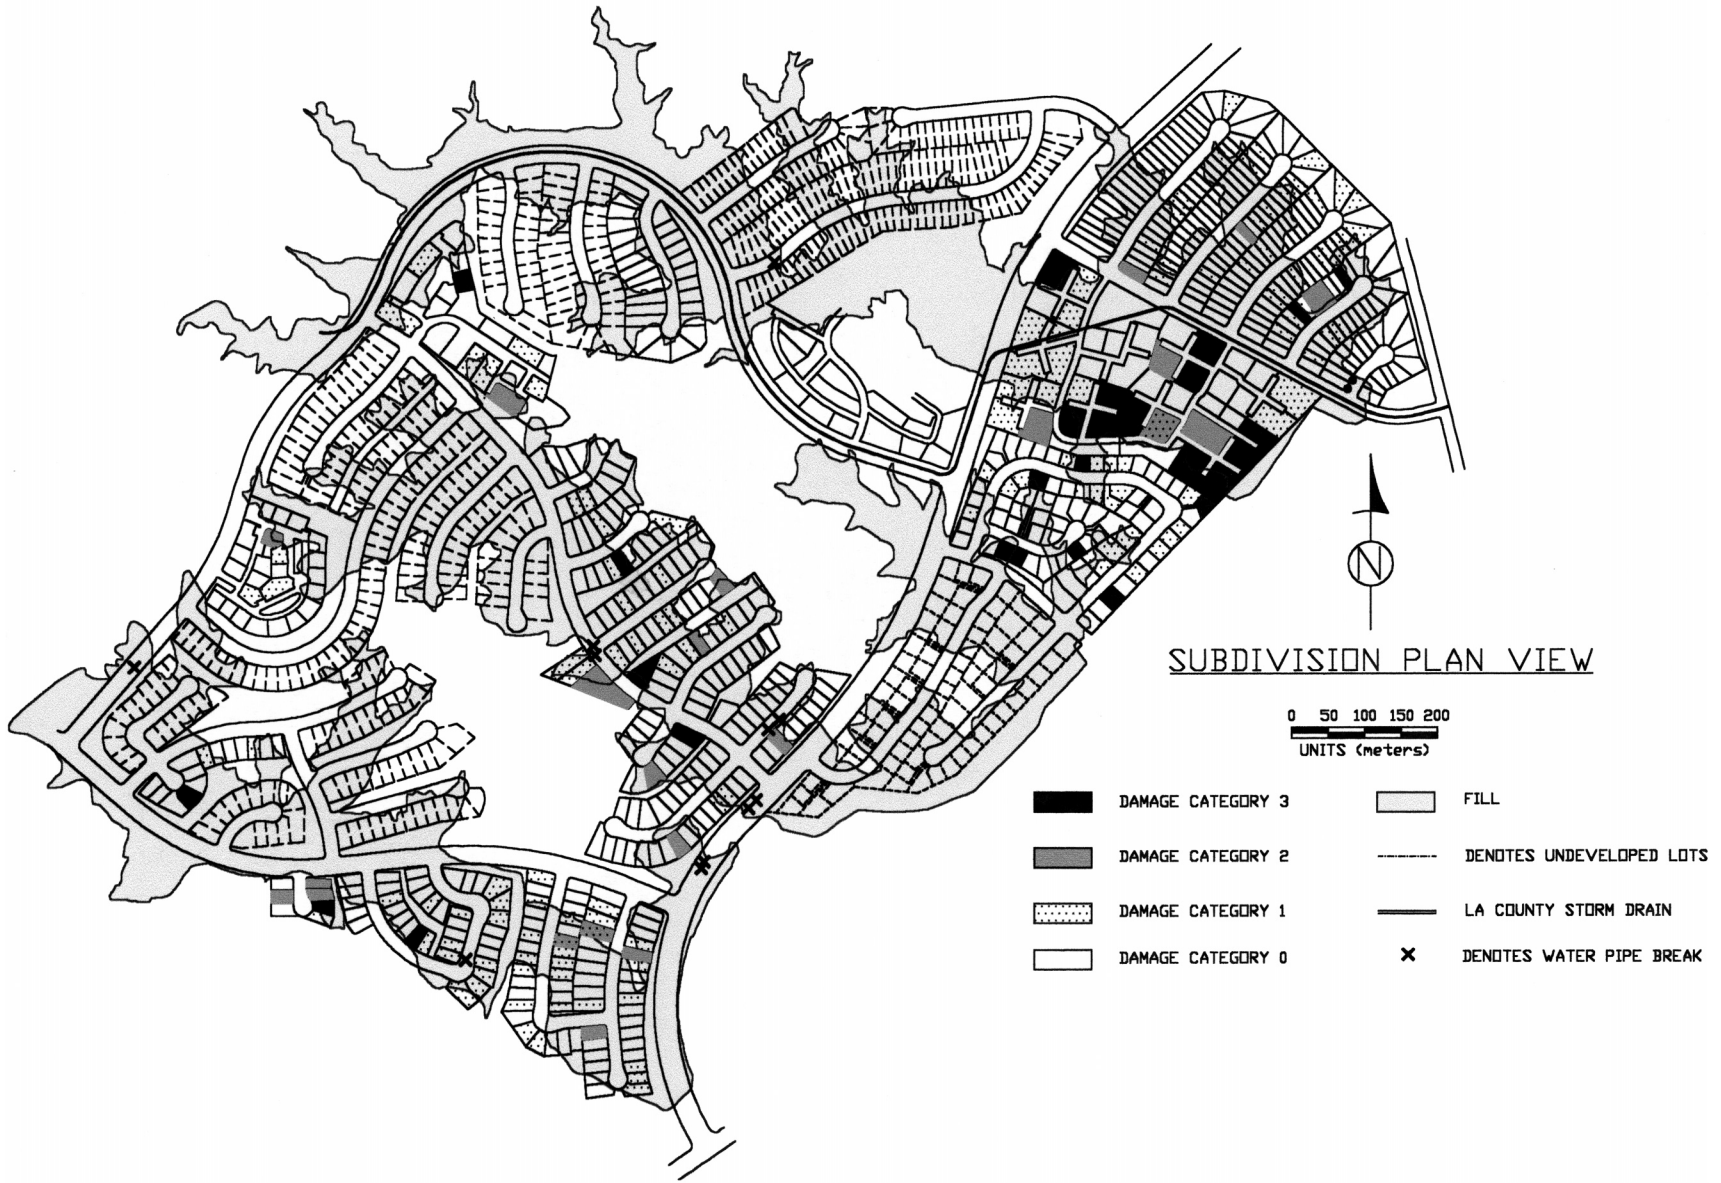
Plan View of Santa Clarita Subdivision Showing Fill and Cut Zones and Locations of Damaged Water Pipes and Structures
